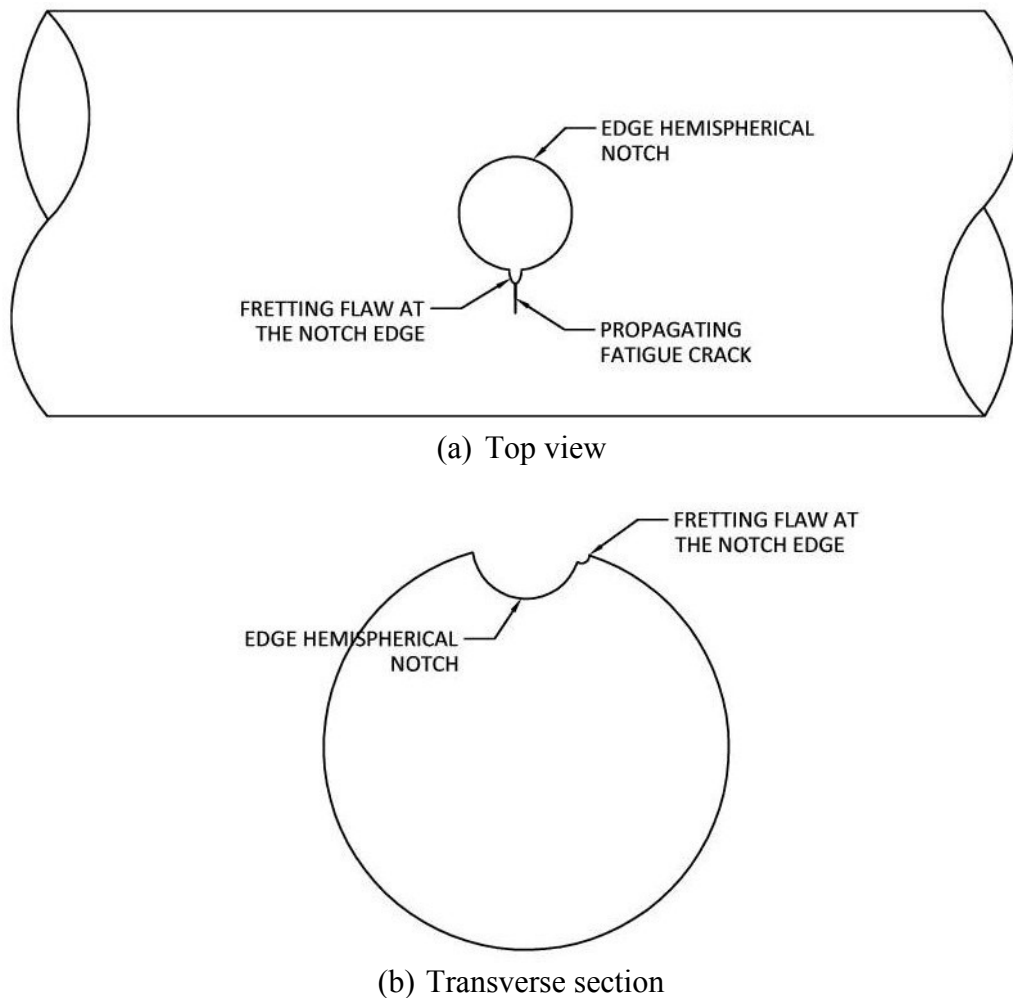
Schematic showing a fatigue crack propagating from a fretting induced flaw intersecting the edge of a pit for a corroded strand-in-beam specimen
